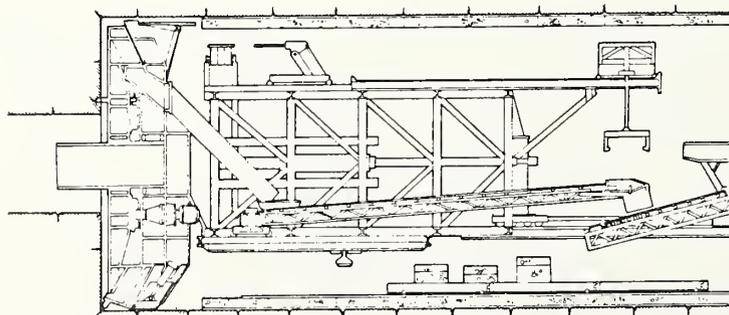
Robbins Tunneling Machine Model 371-110, modified
